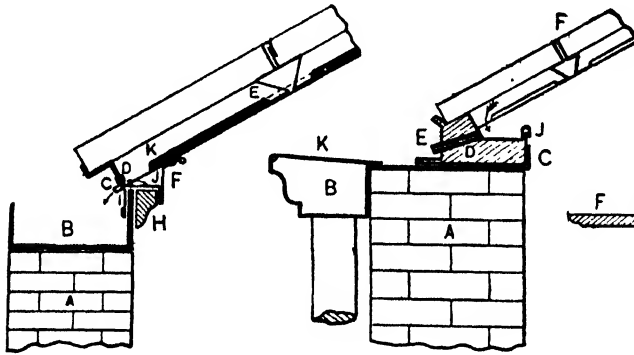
Method of Fastening Lower Part of Skylight on Cast Iron Gutter
